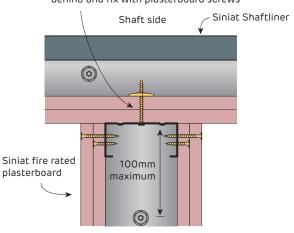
Shaft Wall to Partition Intersecting Wall Plan
